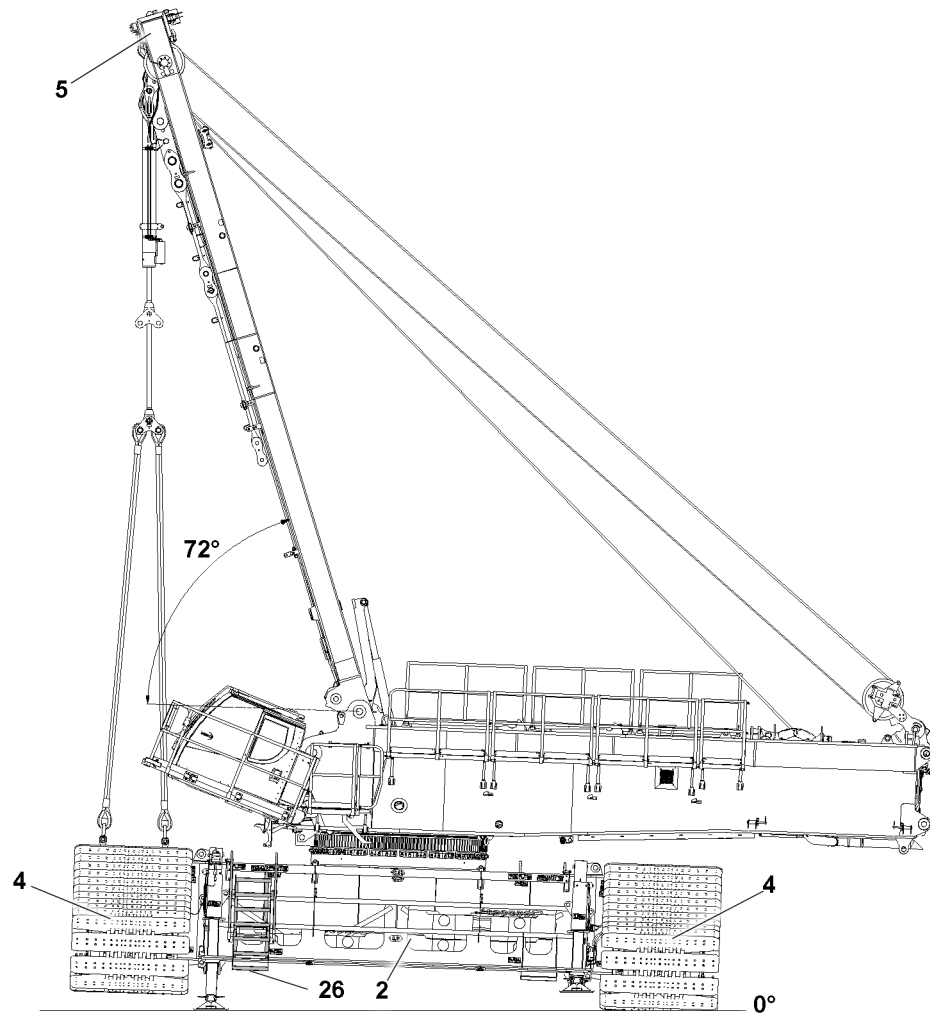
Assembling the second crawler carrier, turntable in the 90° position to the side
